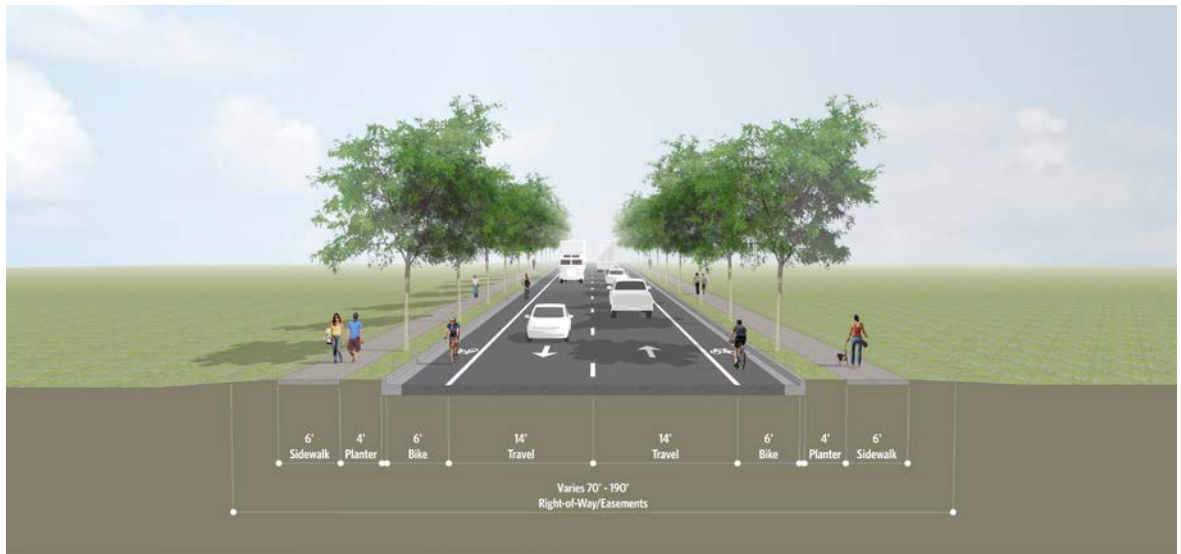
61st Avenue and Future Street Connections 1-2 Cross Sections
